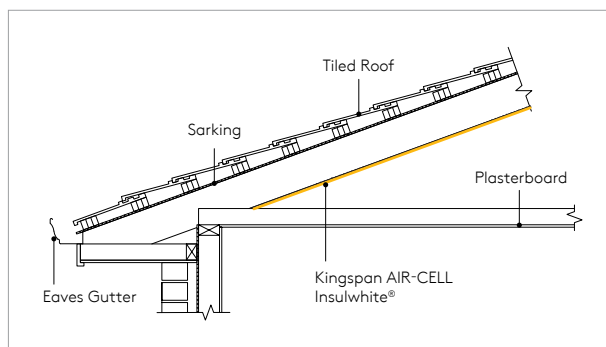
Side elevation of Kingspan AIR-CELL Insulwhite® in a pitched timber framed tiled roof retrofit installation (attic conversion).
